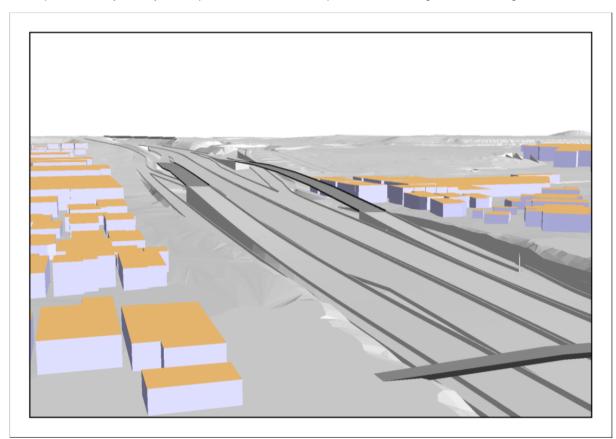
EIS Homebush Bay Drive interchange (oblique elevation, facing west)
